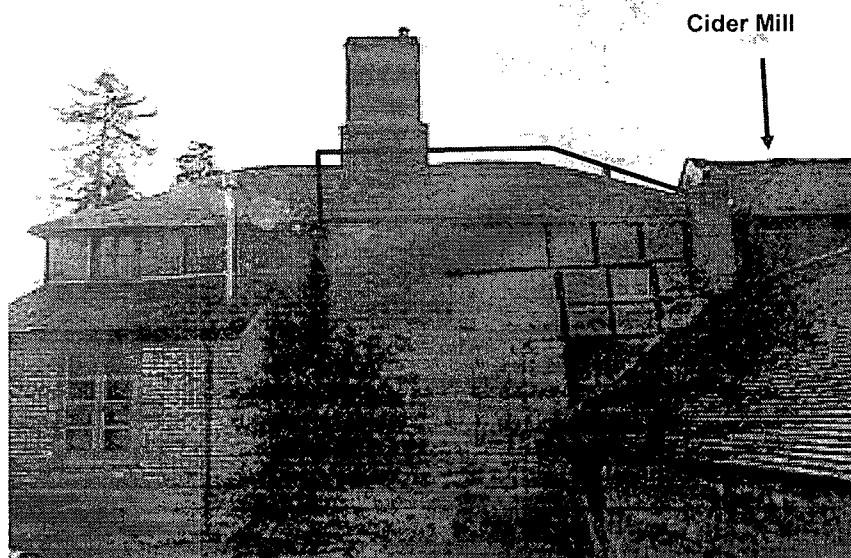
View from north east. Roof area further highlighted, note Cider Mill roof line.
